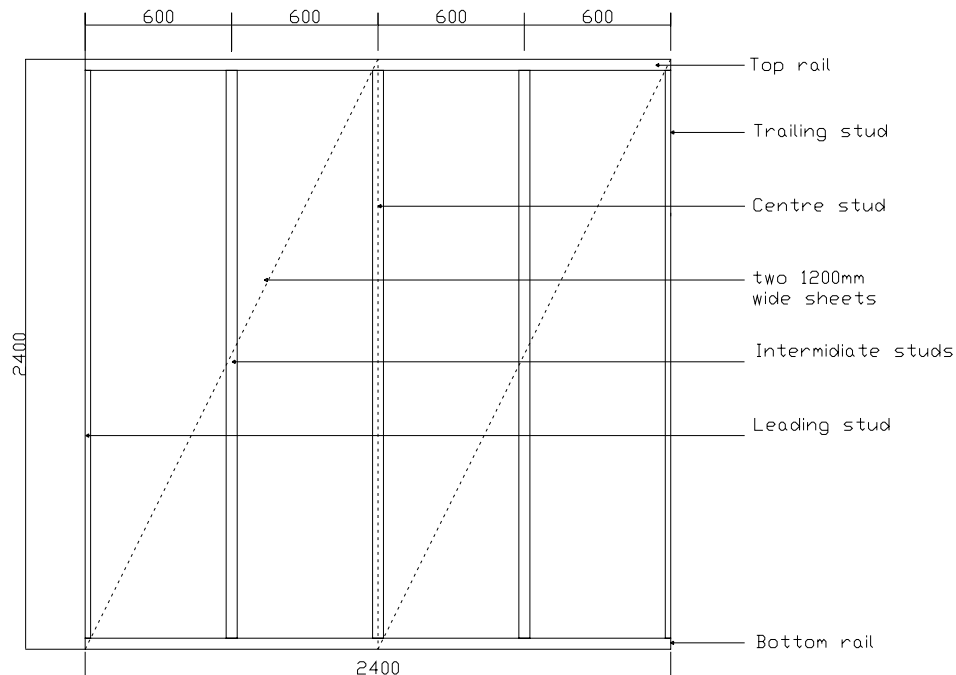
Details of test panel, EN 594 (Anon. 1995)
